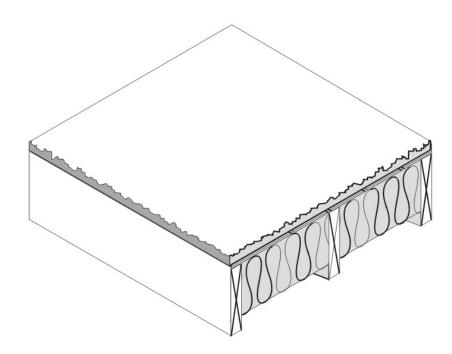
Wood Framed Floor with a Crawl Space
